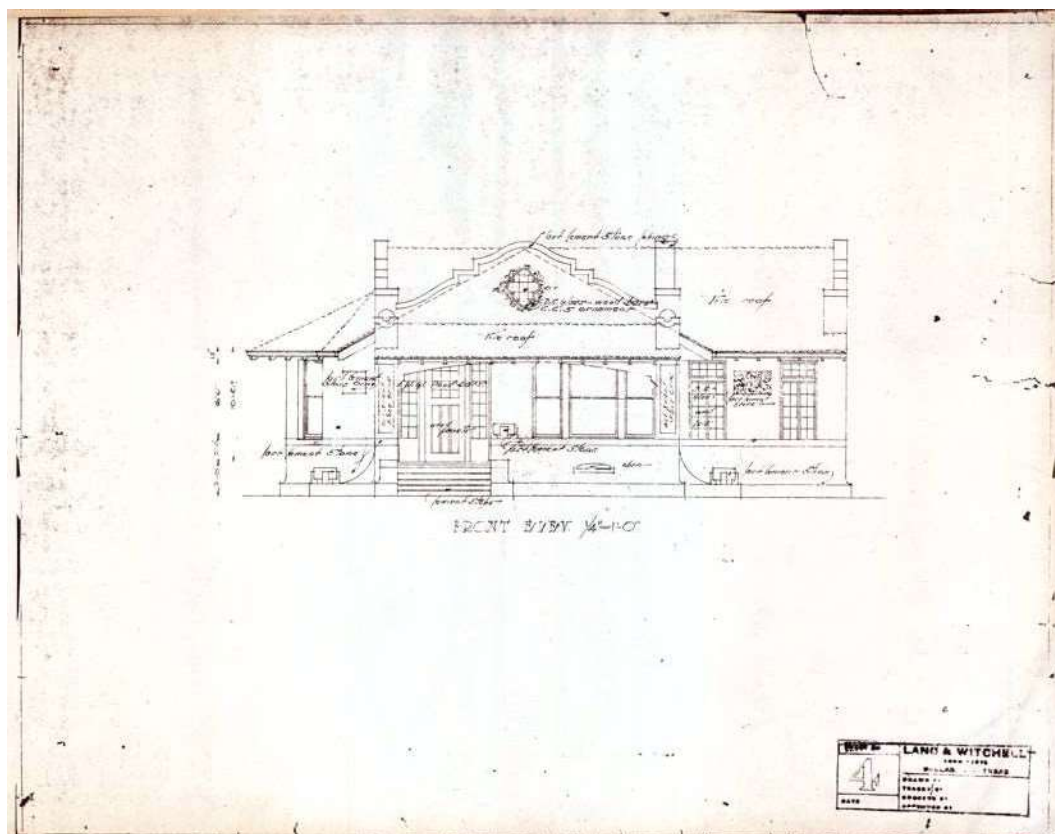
Original Lang and Witchell Front (Southeast) Elevation – Sheet 4
